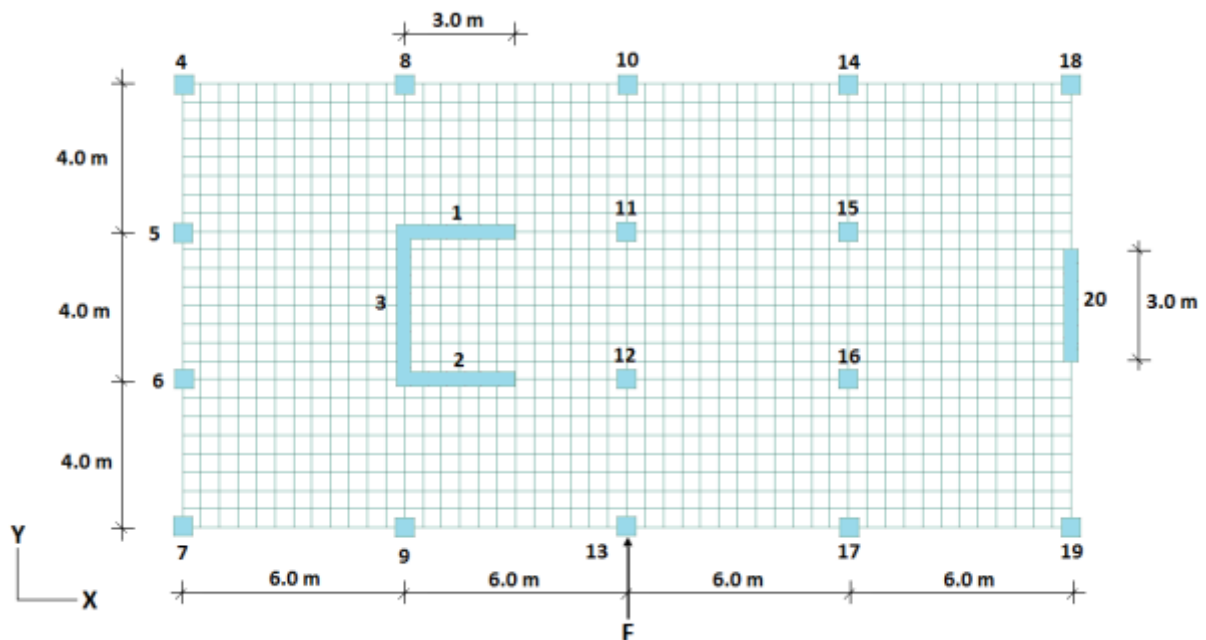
24 m x 12 m floor plan for 25 Storey Building
